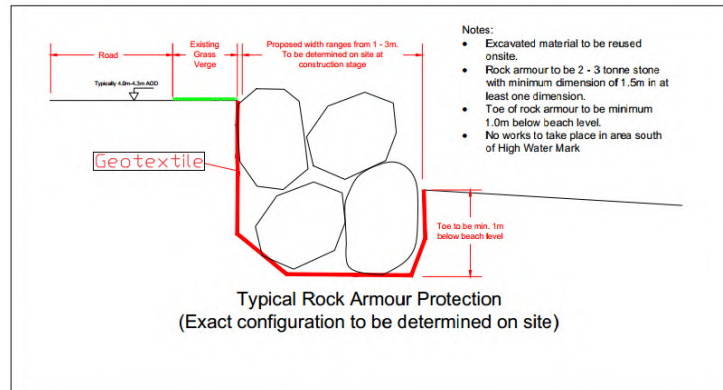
Extract of civil engineering drawings for proposed Coastal Works at Bellurgan showing section through proposed rock armour for Locations A and B Work Areas
